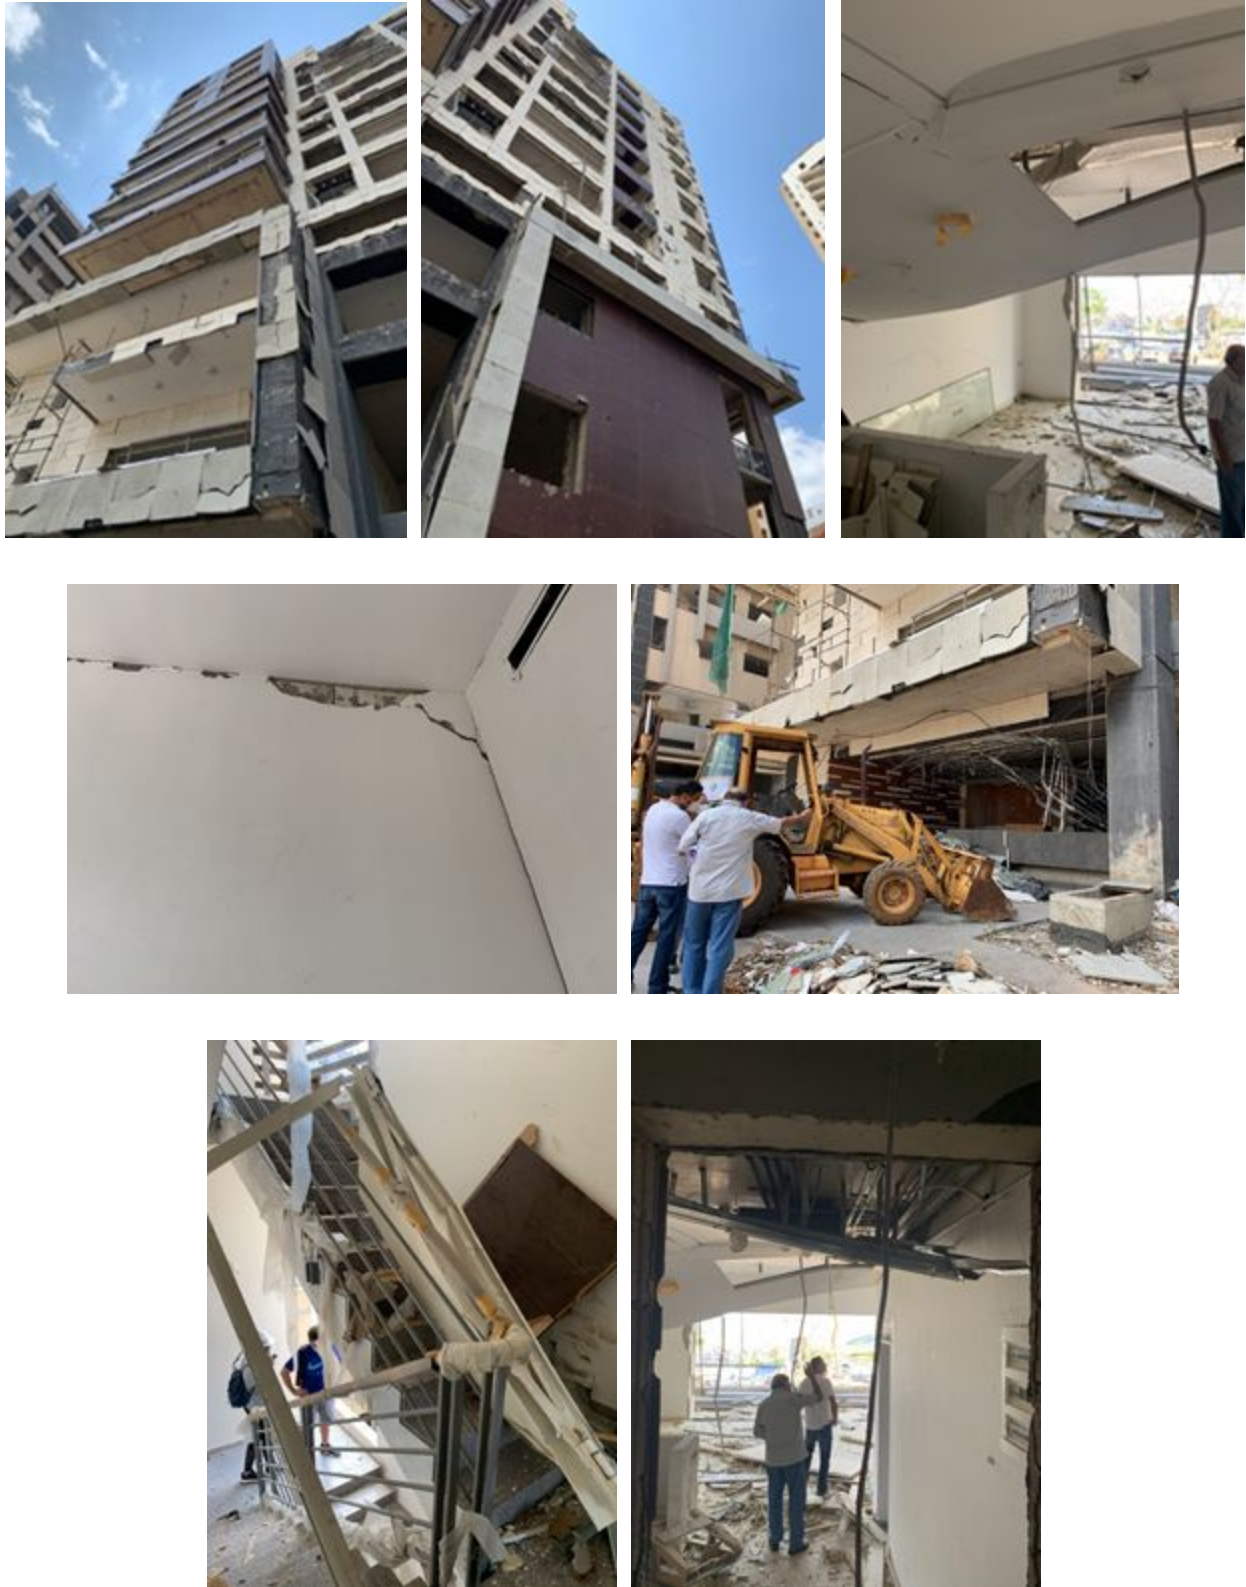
Moderately damaged (D2) new reinforced concrete building RC2 (33.8960° N, 35.5198° E).
